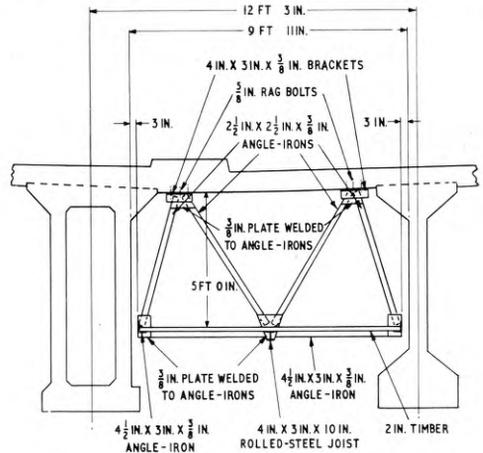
TYPICAL SUSPENDED JOINTING PLATFORM
